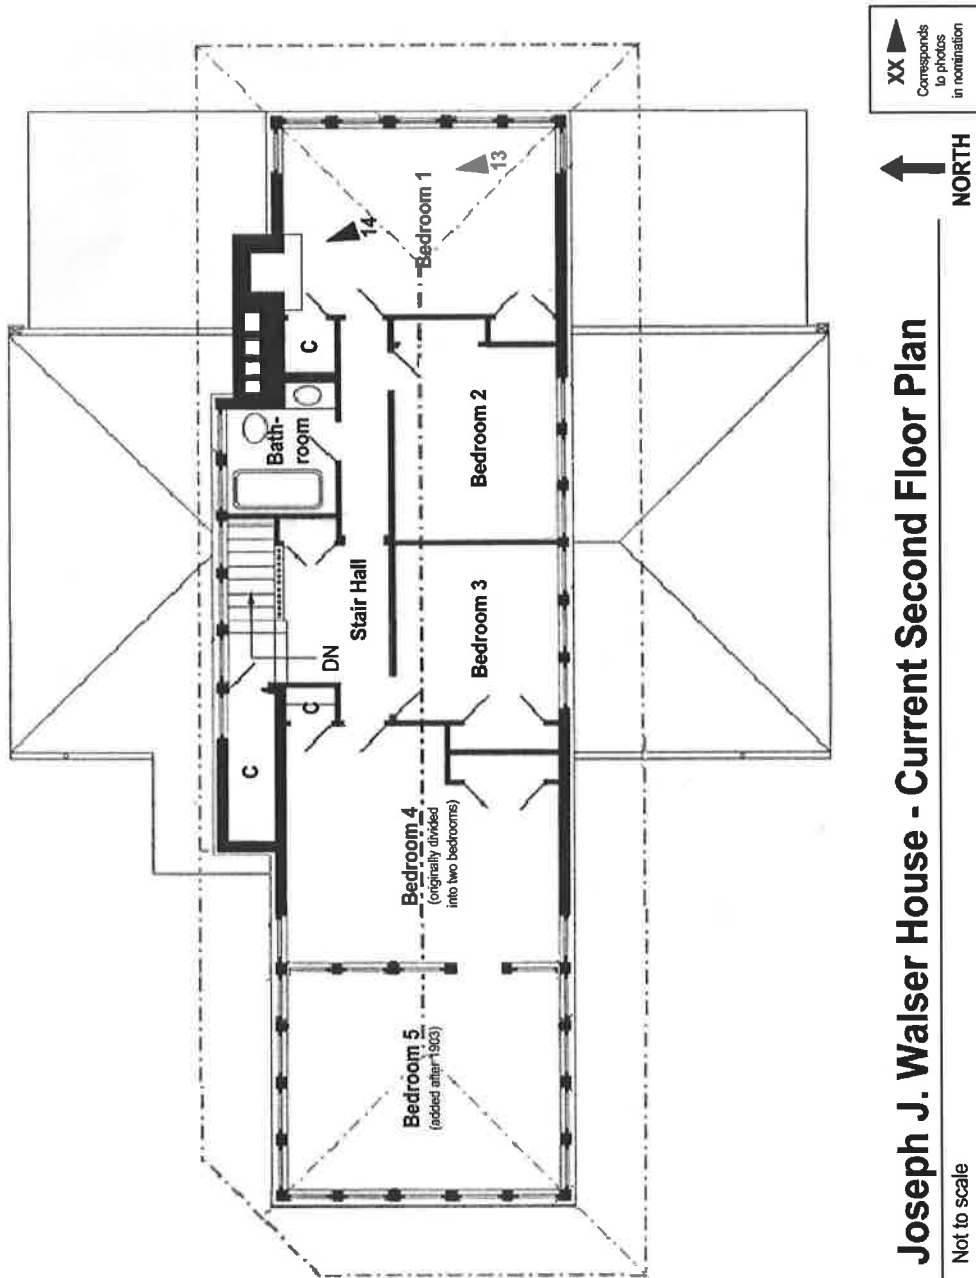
Joseph J. Walser House current second floor plan. Numbered arrows correspond to photos attached to nomination.
